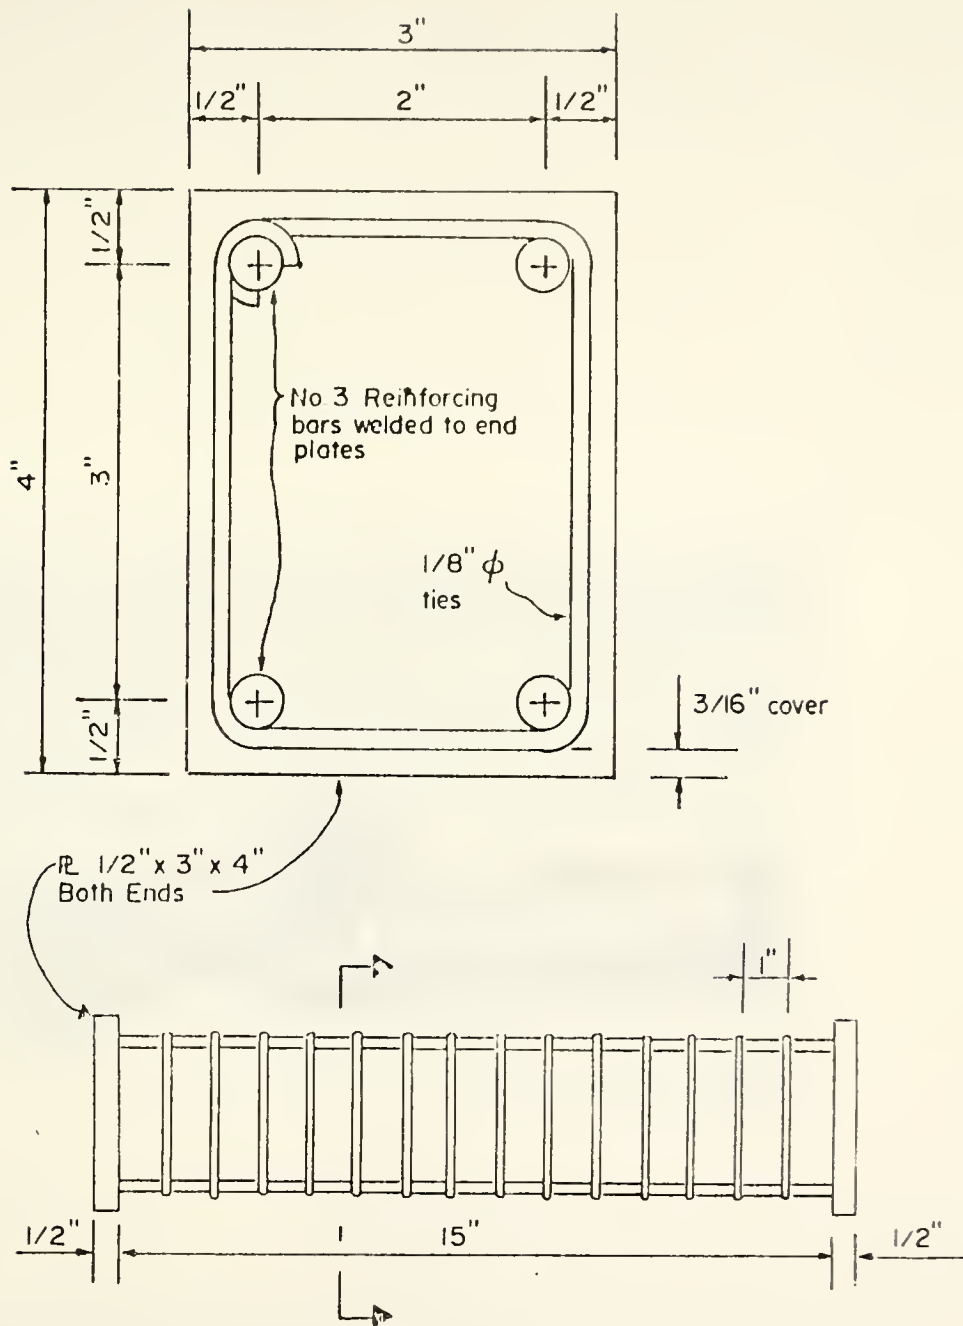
FREEZE-THAW SPECIMEN REINFORCEMENT ARRANGEMENT
